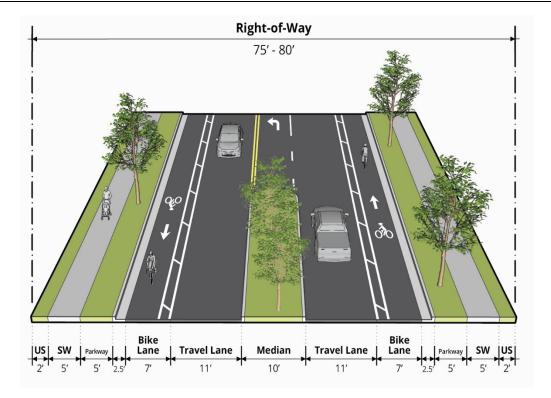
Avenue Cross Section Standards - Buffered Bike Lane
